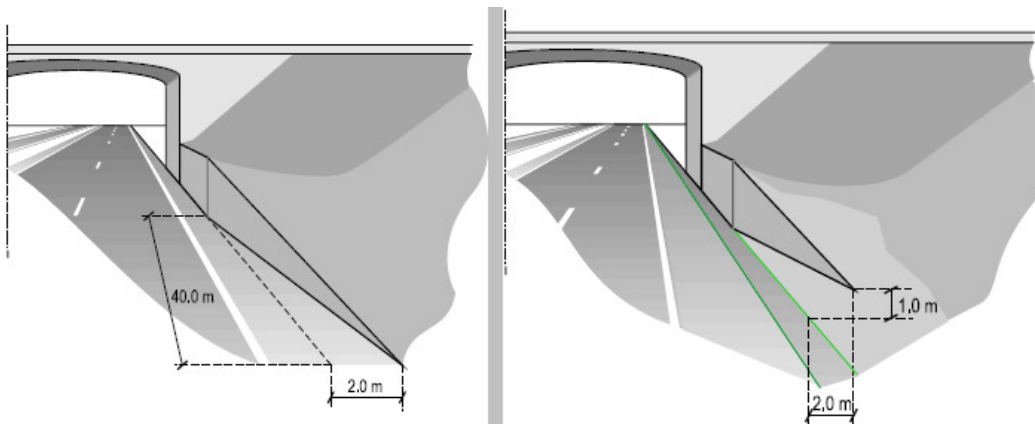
Example of the end design of a retaining wall close to the carriageway [A.34]
